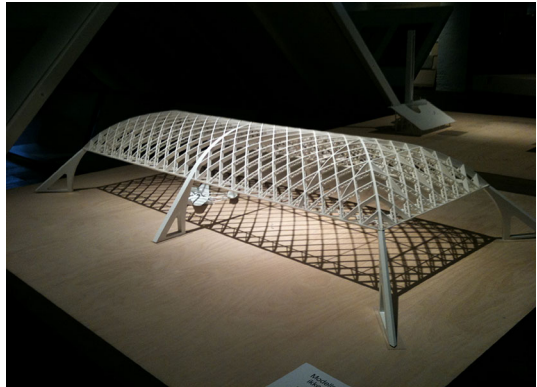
Steel lamella dome canteen roof structure, Copenhagen School of Architecture
